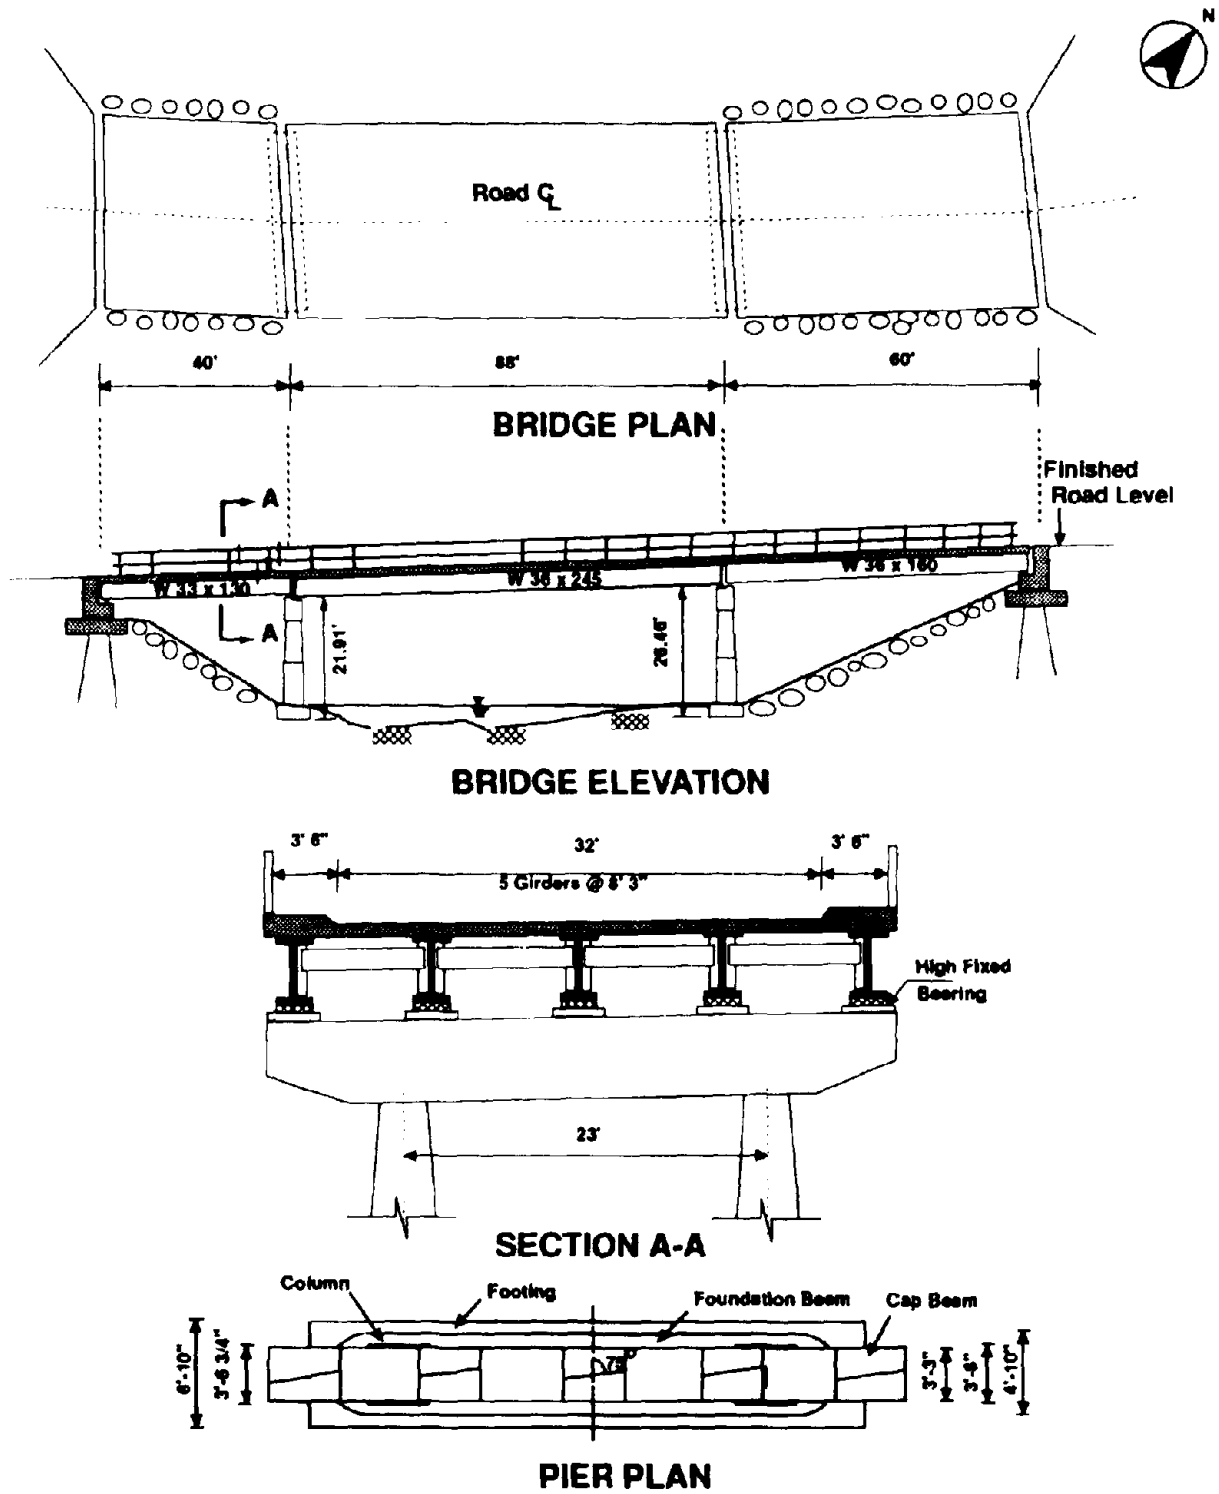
Jewett-Holmwood Road Bridge over East Branch of Cazenovia Creek
